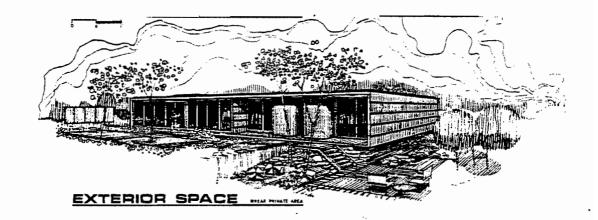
UNIT DESIGN: SITE PLANNING AS A DETERMINANT
